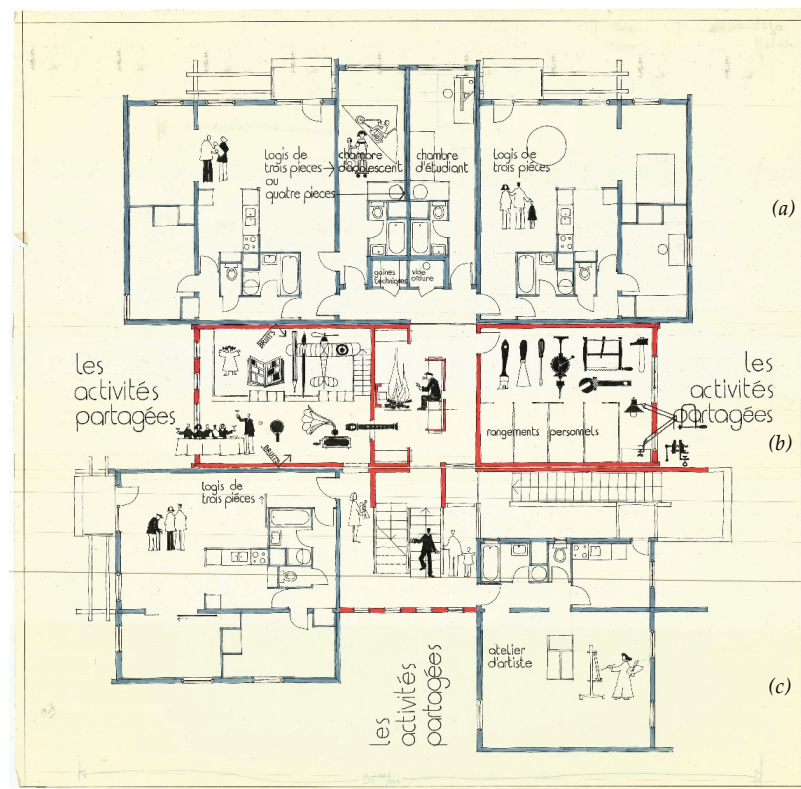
Current floor plan of one of the four corner buildings, called pillars, with the common spaces marked in red in 1976 (archives architecturestudio). Translation below.
